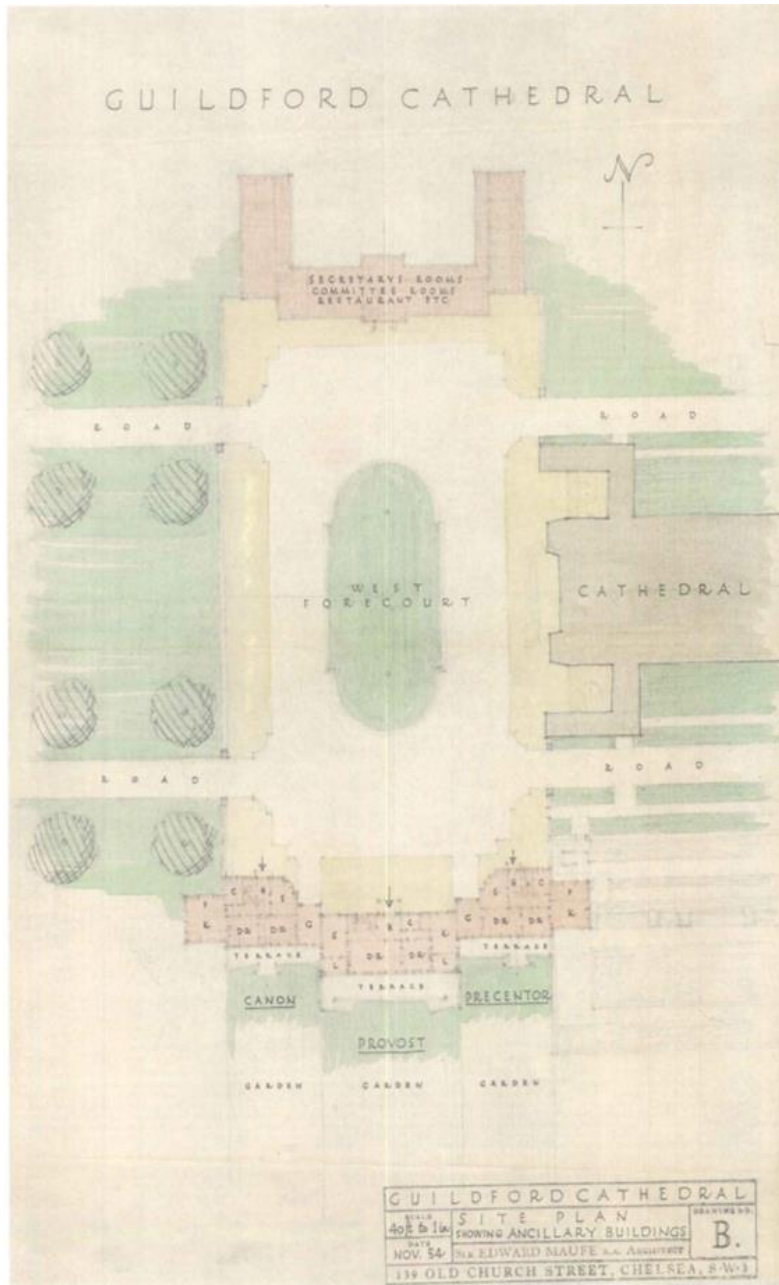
Illustration G: Guildford Cathedral Site Plan Showing Ancillary Buildings by Sir Edward Maufe (November 1954)
